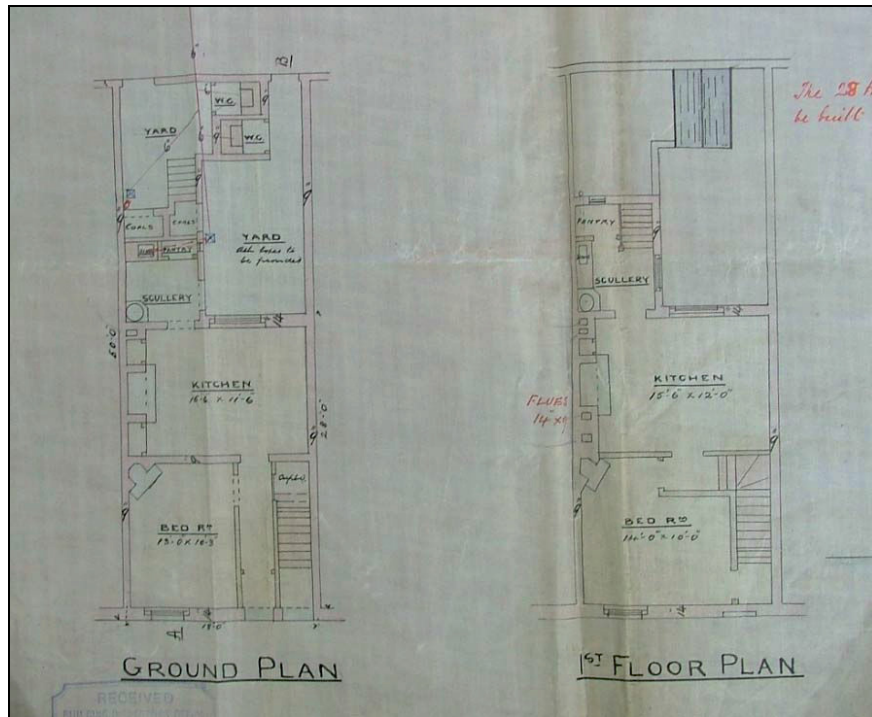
Ground and first floor plans of proposed houses on Hawick Crescent 1888
